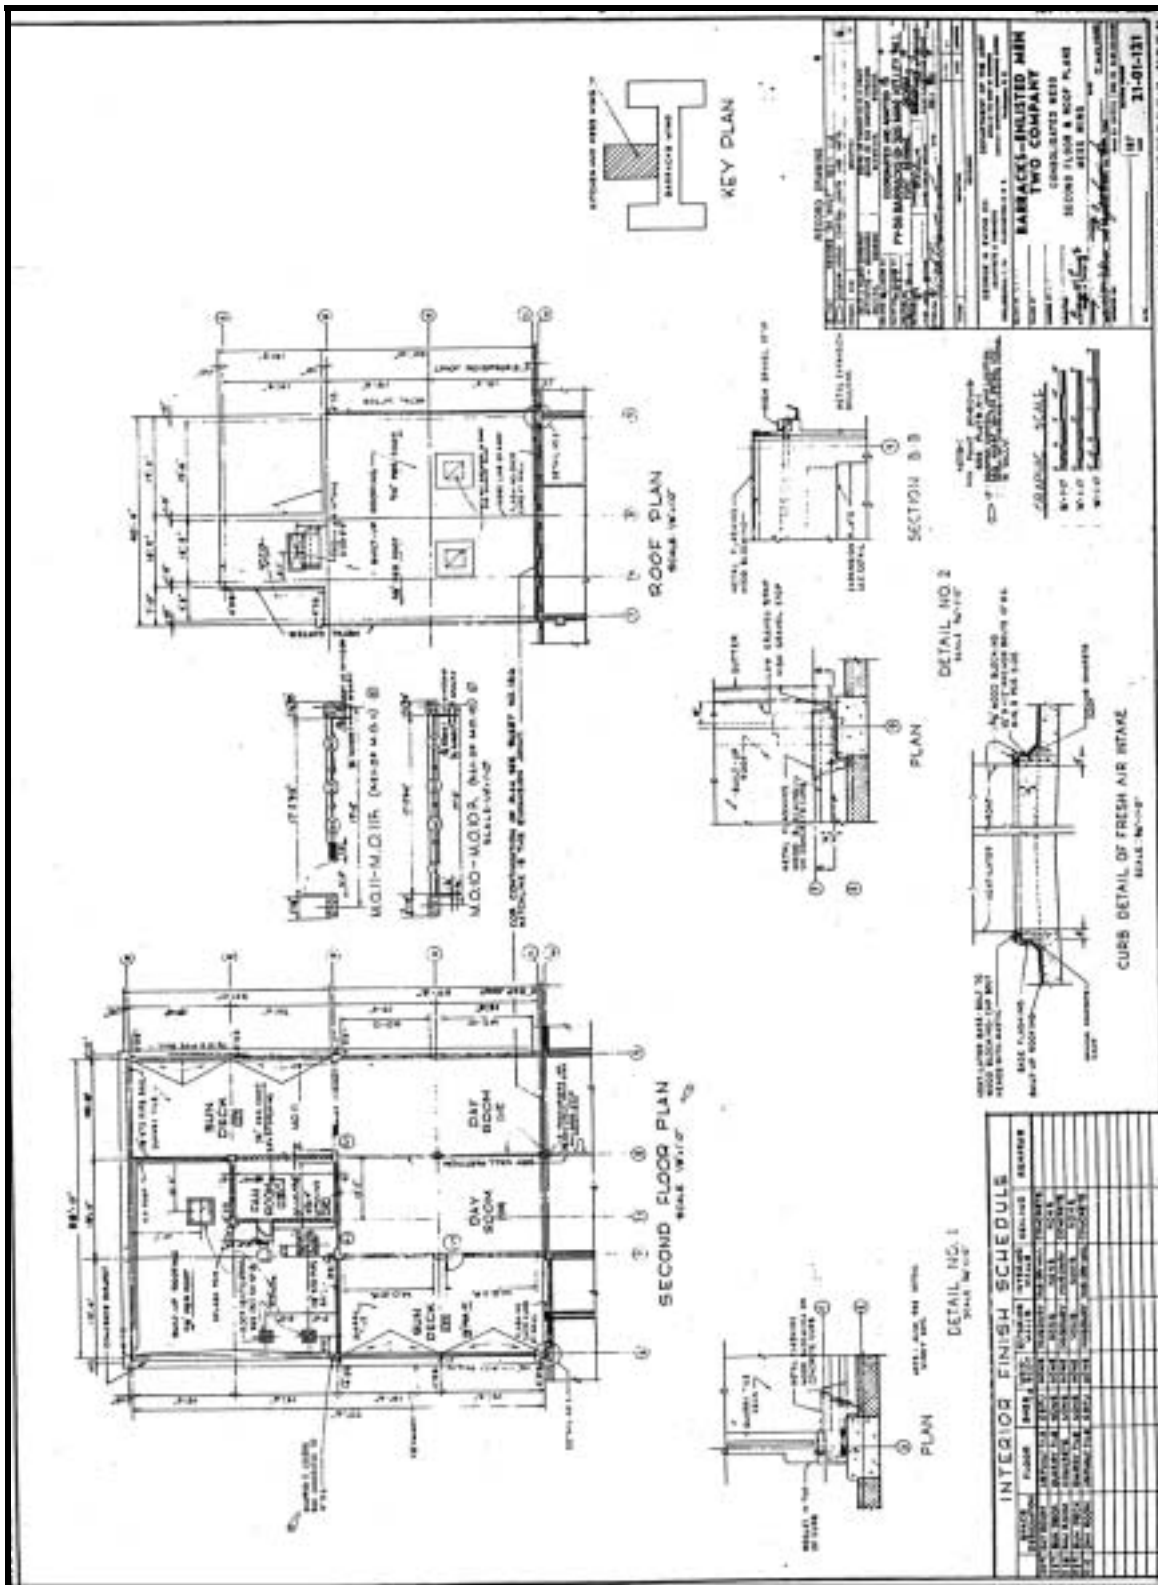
H-style, two-company barracks, mess wing, second floor and roof plan (1953, revised 1955) (Engineering, Ft. Benning).
